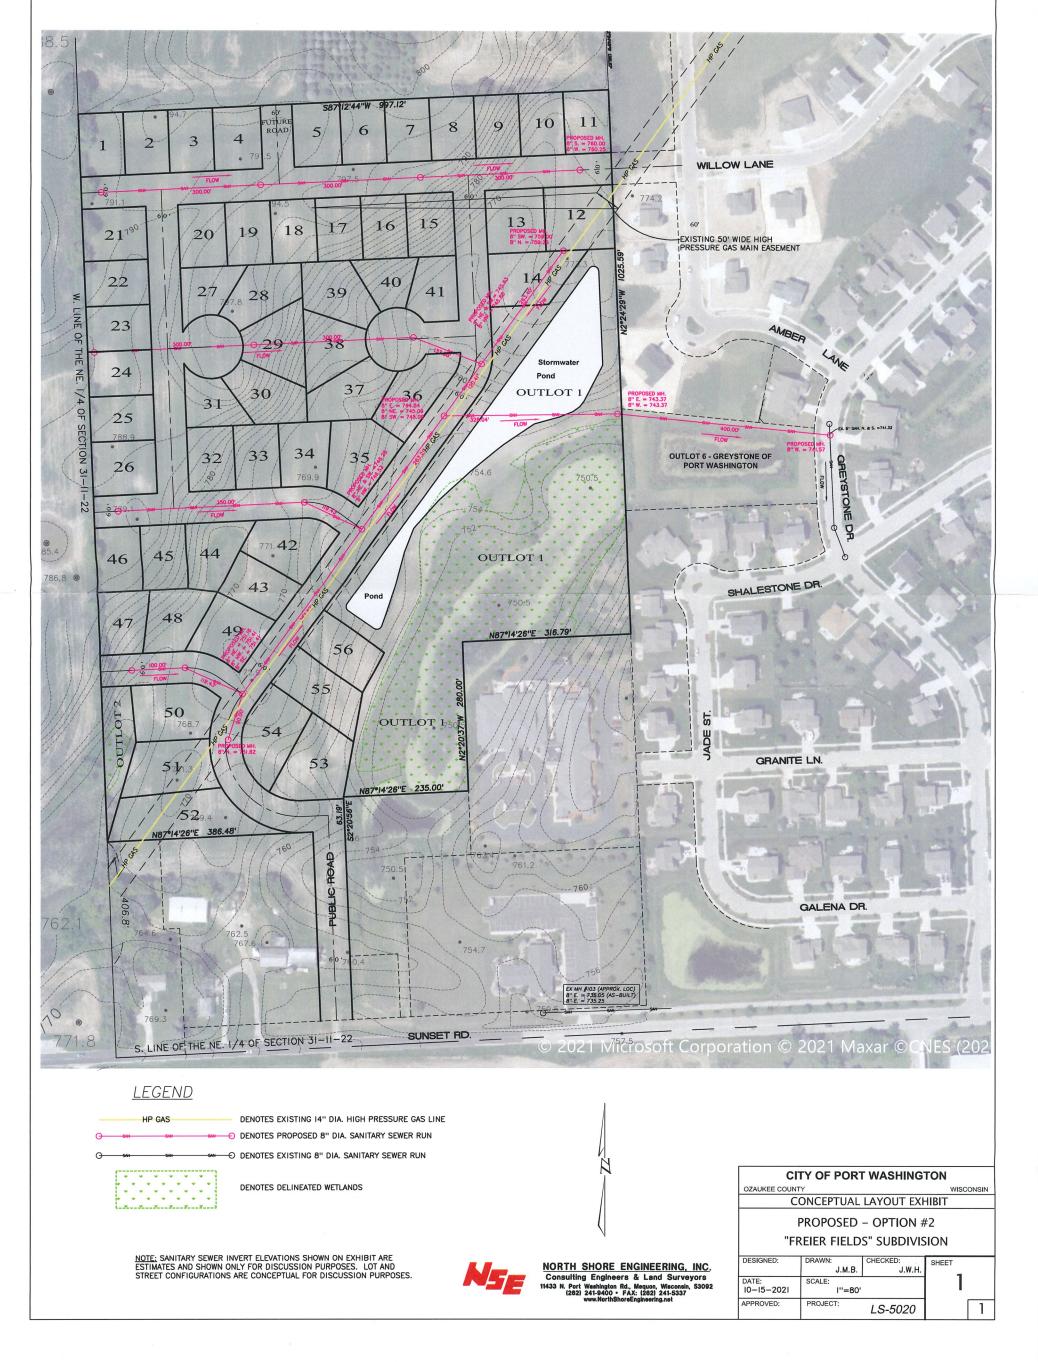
EXHIBIT-PROPOSED SUBDIVISION OF LANDS IN THE NORTHEAST 1/4 OF SECTION 31-11-22
